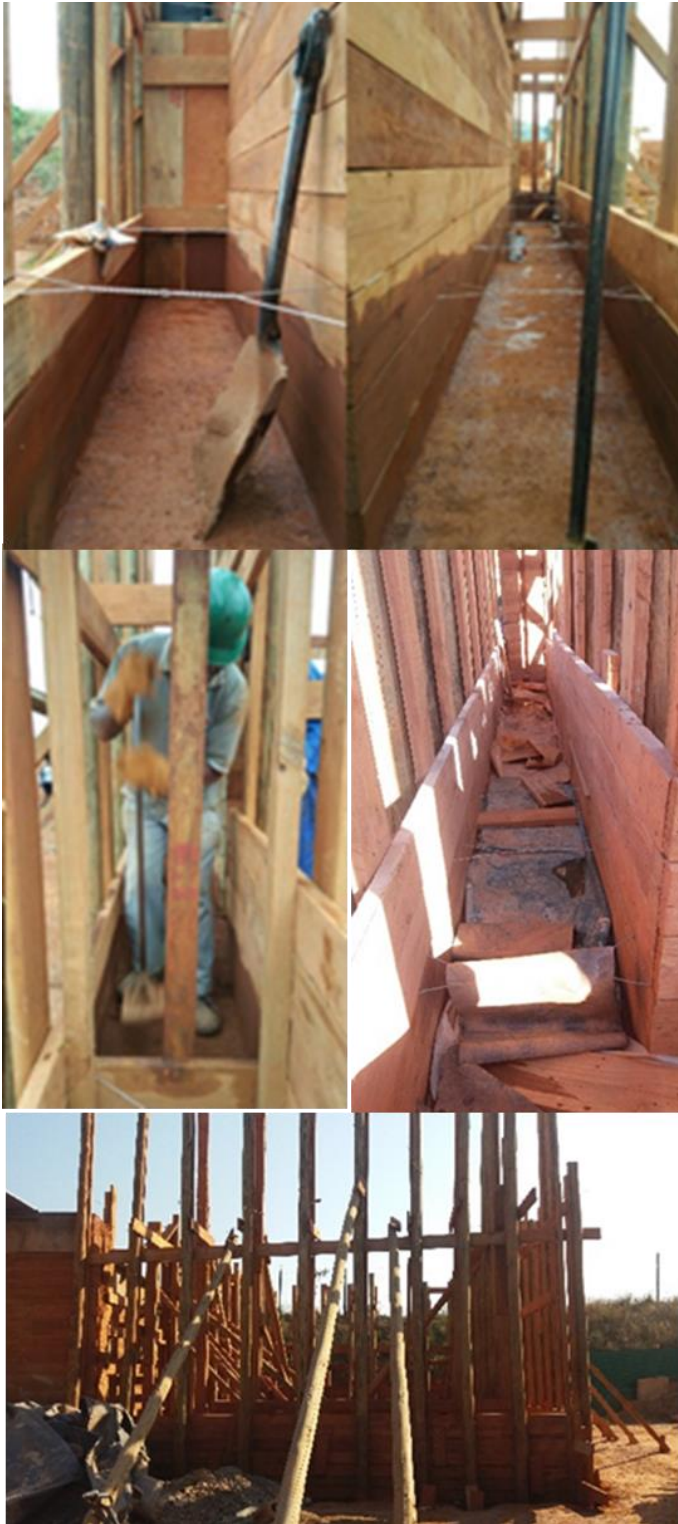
illustrates rammed earth wall construction. (Source: By Author, 2019).
